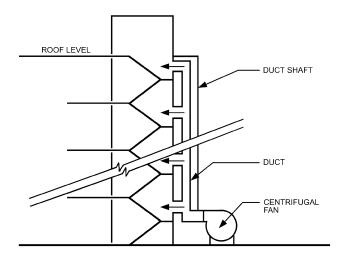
Stairwell Pressurization by Multiple Injection with Fan Located at Ground Level
